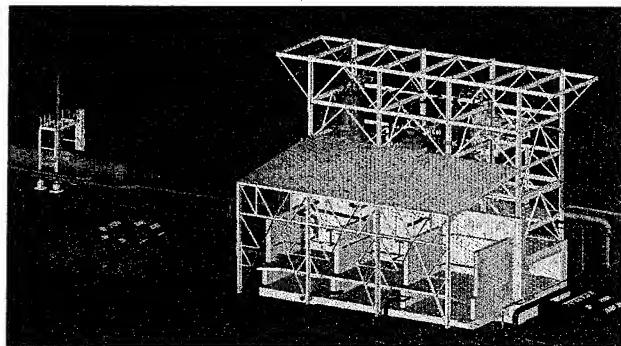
CAD model of test stand E1 consisting of major tankage and structure for 750Klbf thrust.
